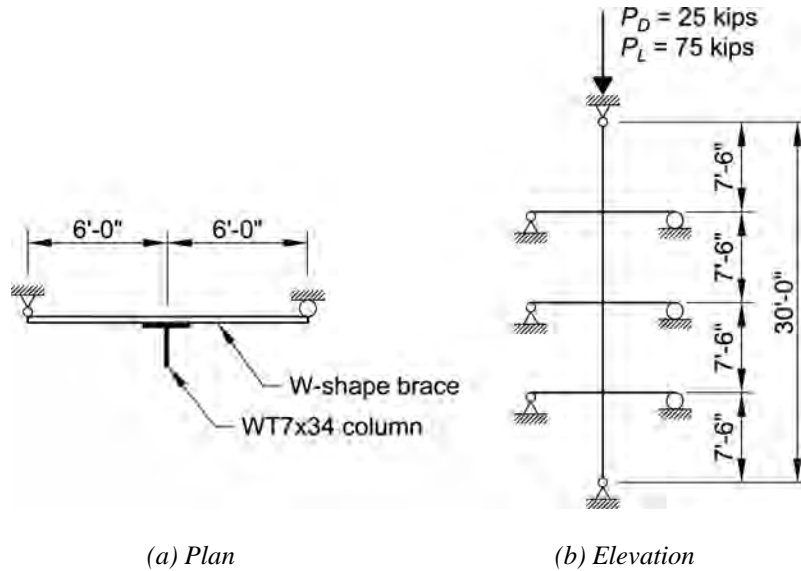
Column bracing geometry for Example A-6.2.
